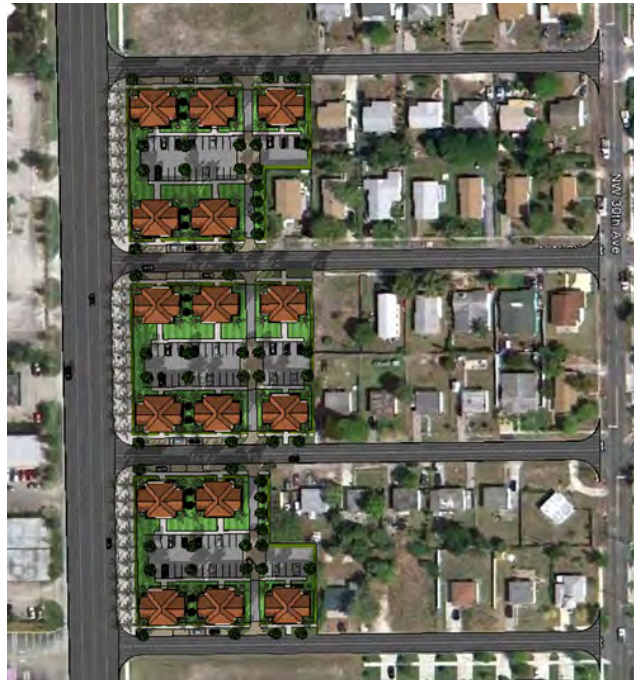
NW 31st. Avenue Garden Apartments Option Plan View
